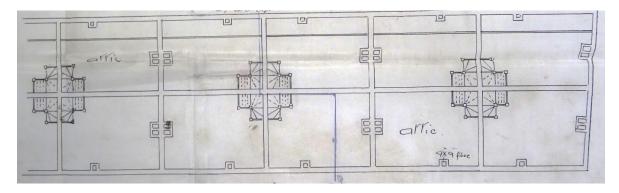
The attic had a single bedroom with an open stair and no fireplace (Carby Hall 1893).
